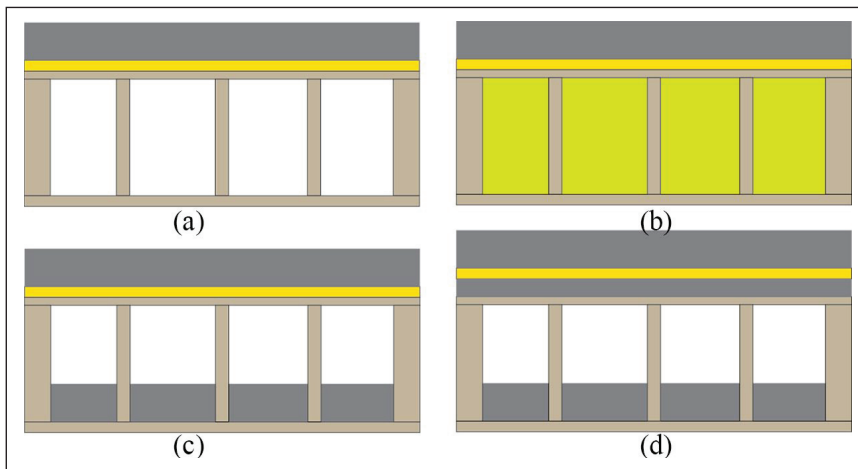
Hybrid top floor constructions. (a) Empty bare floor with concrete or wet screed on continuous resilient layer. (b) Bare floor with porous absorber and concrete or wet screed on continuous resilient layer. (c) Gravel filled bare floor with concrete or wet screed on continuous resilient layer. (d) Gravel filled bare floor with concrete or wet screed on continuous resilient layer with additional gravel layer directly above the hollow box.
